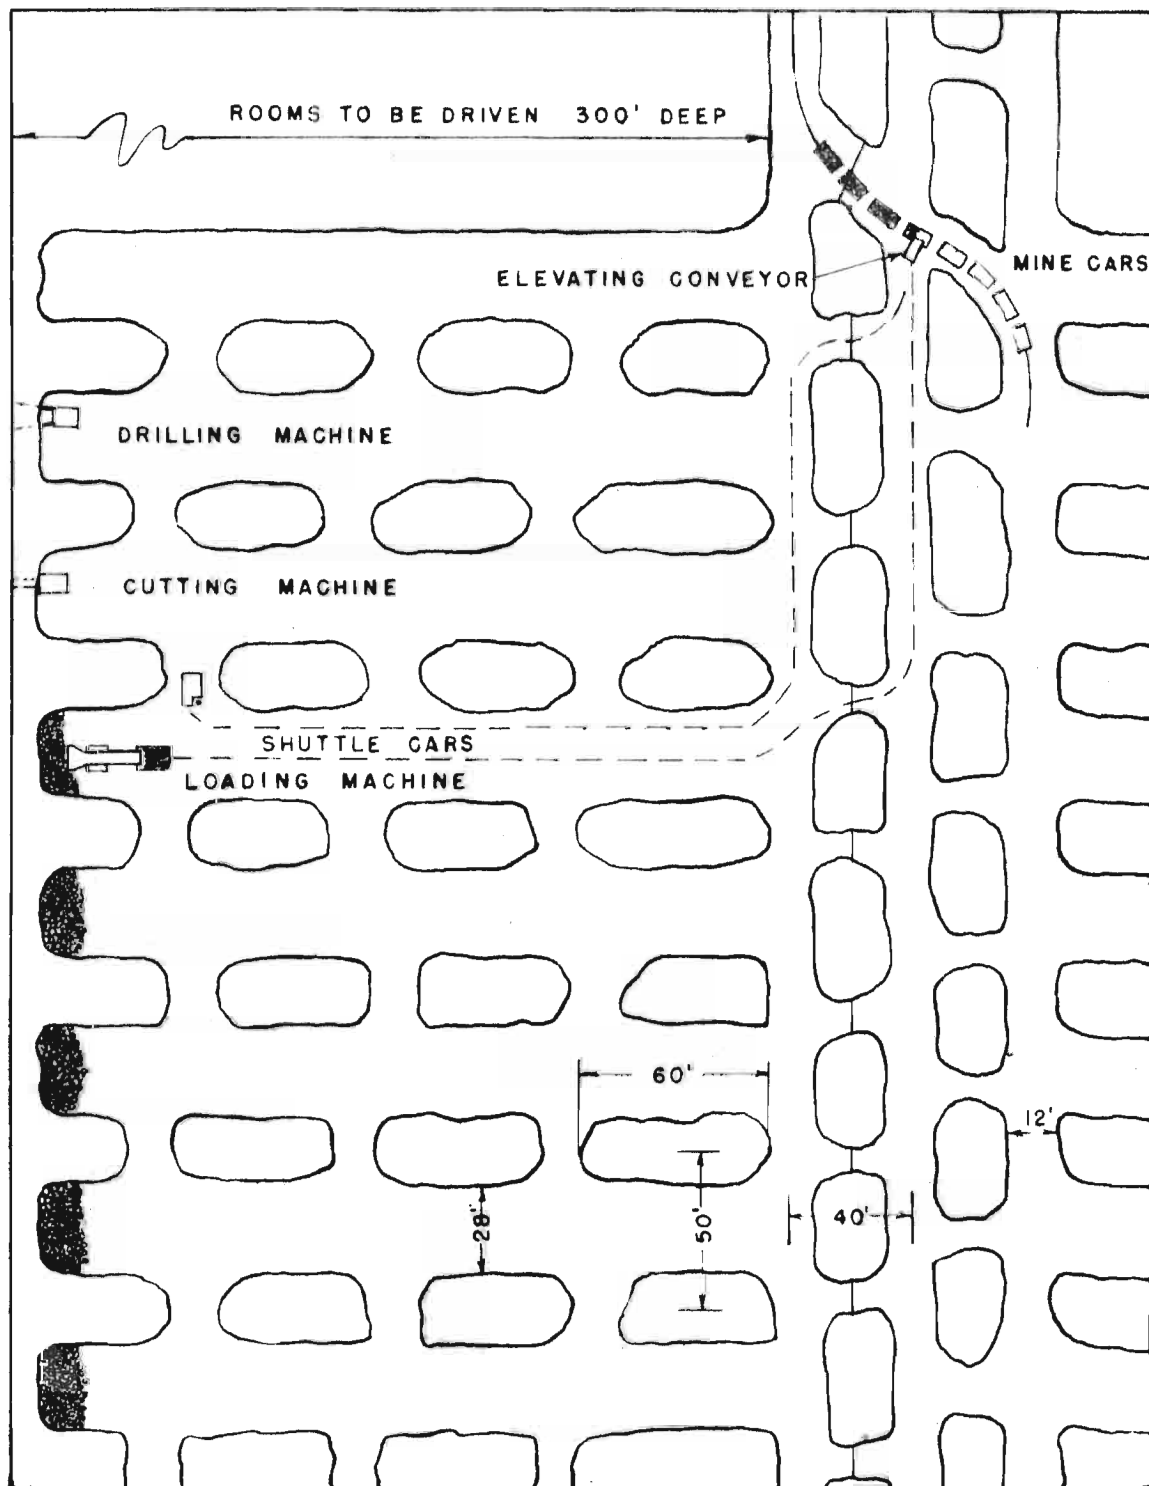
Advancing panel system with mobile loader and two cable-reel shuttle cars.
